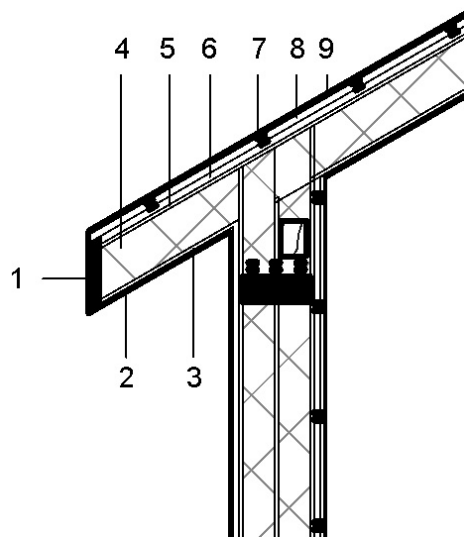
Autodesk Revit model of scenario D-6 of wall-roof junction
